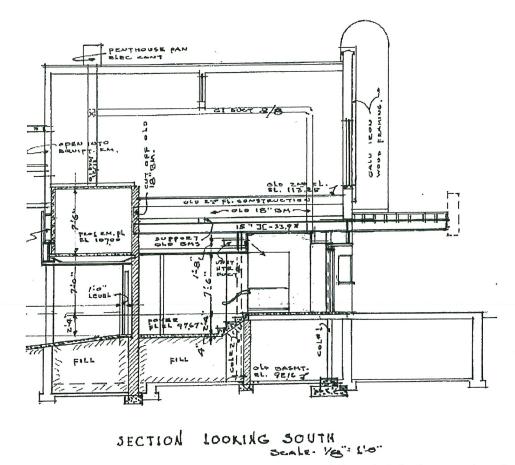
Sectional view across front lobby and second floor (original renovation plans)
